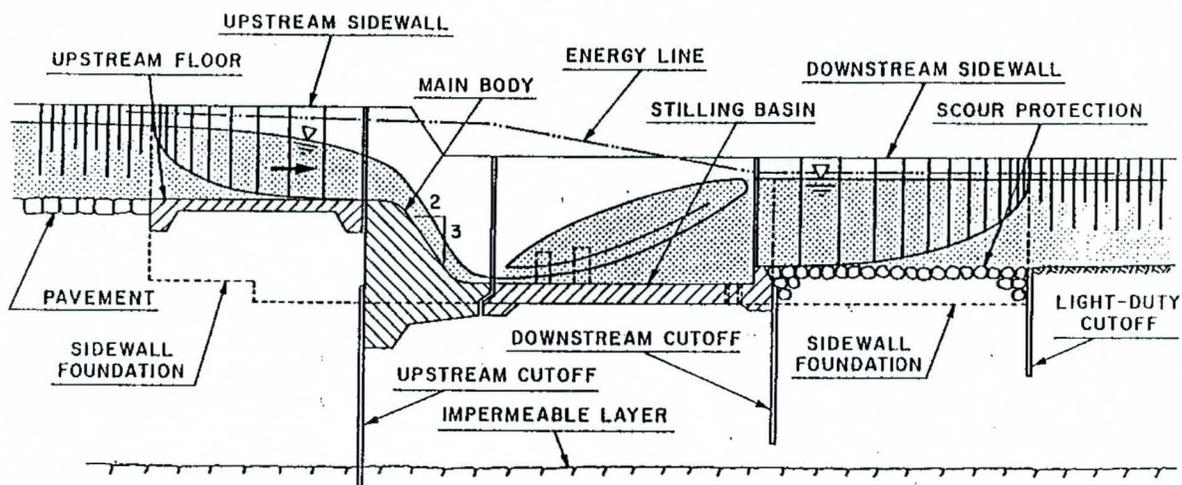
Standard design cross section of steep-slope drop structure (after von Hausler 1976).
